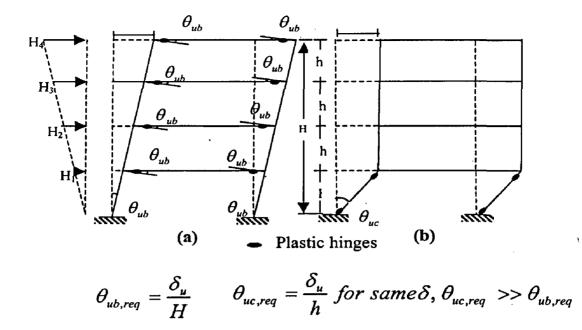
Failure mechanism of a frame: (a) beam mechanism (b) storey mechanism
